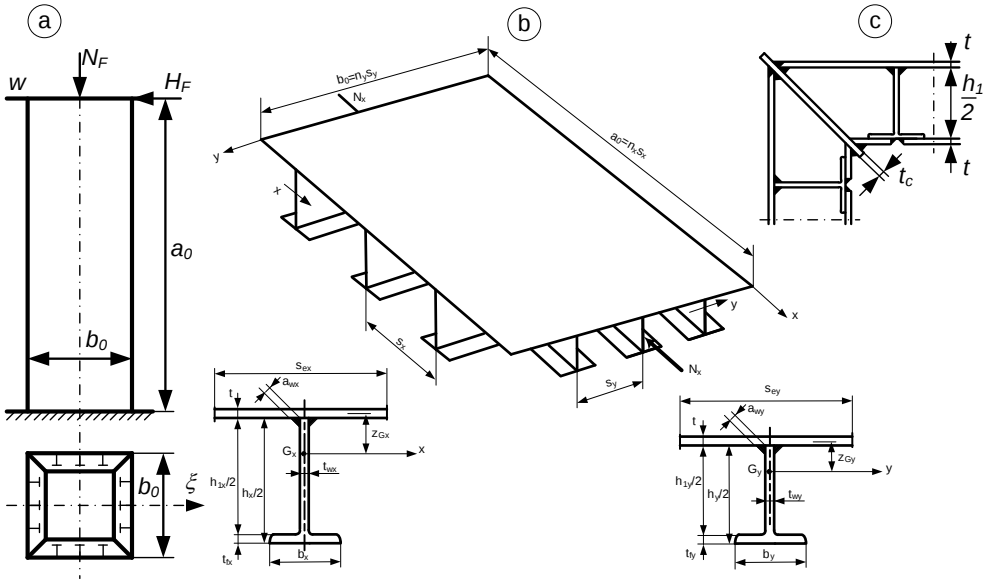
A cantilever column can be constructed of stiffened or cellular plates. (a) Main dimensions and loads, (b) orthogonally stiffened plate, (c) corner construction with cellular plates
